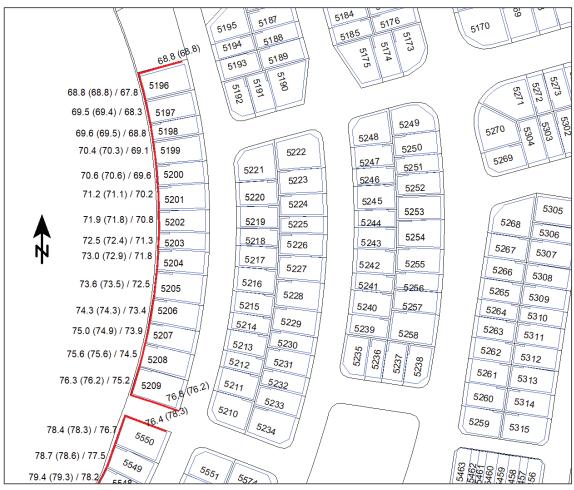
Noise Barrier Relative Elevations, m – Barrier Base (Dwelling Average) / Closest Road Lane
